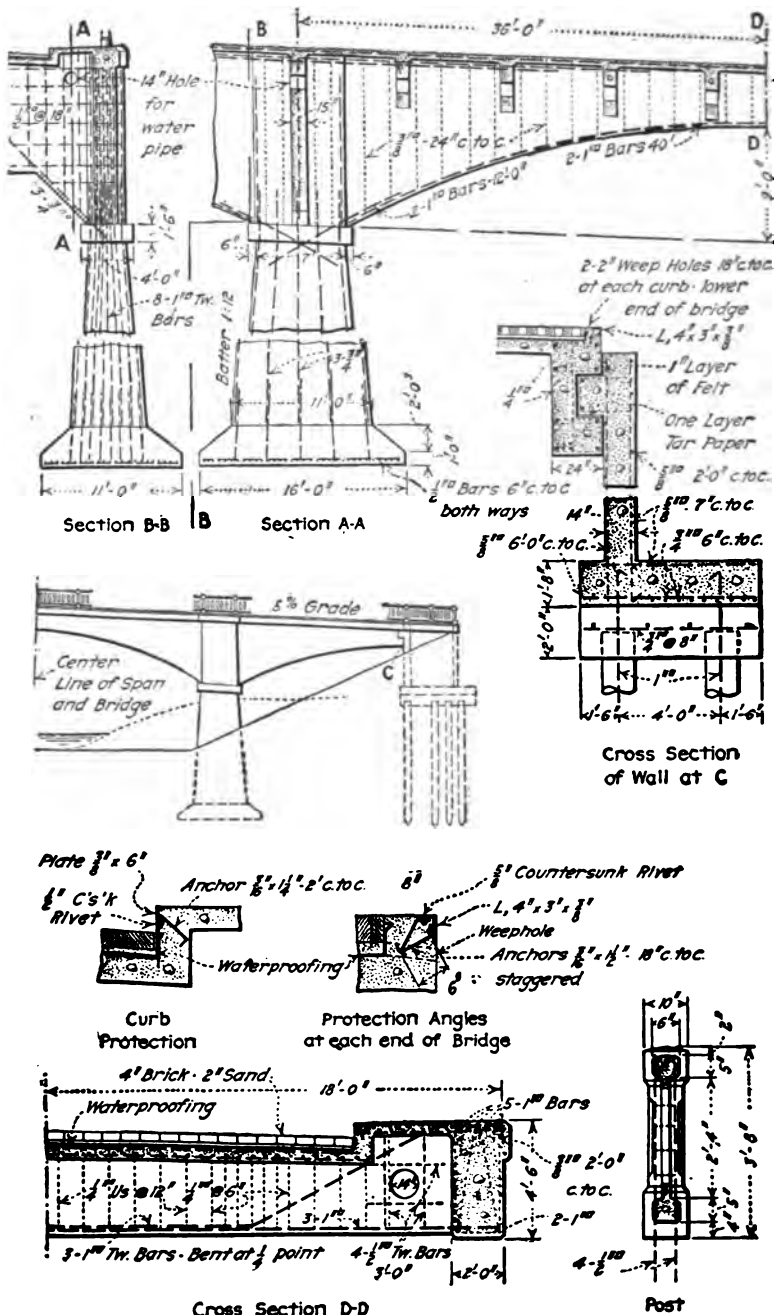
Details of Runnymede Avenue bridge over West Fork Creek, Cincinnati, Ohio.
